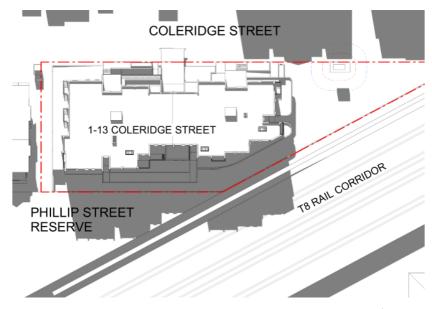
Excerpt from the Architectural Plans - Shadow diagram at 12pm midwinter (Source: WMK Architecture)
